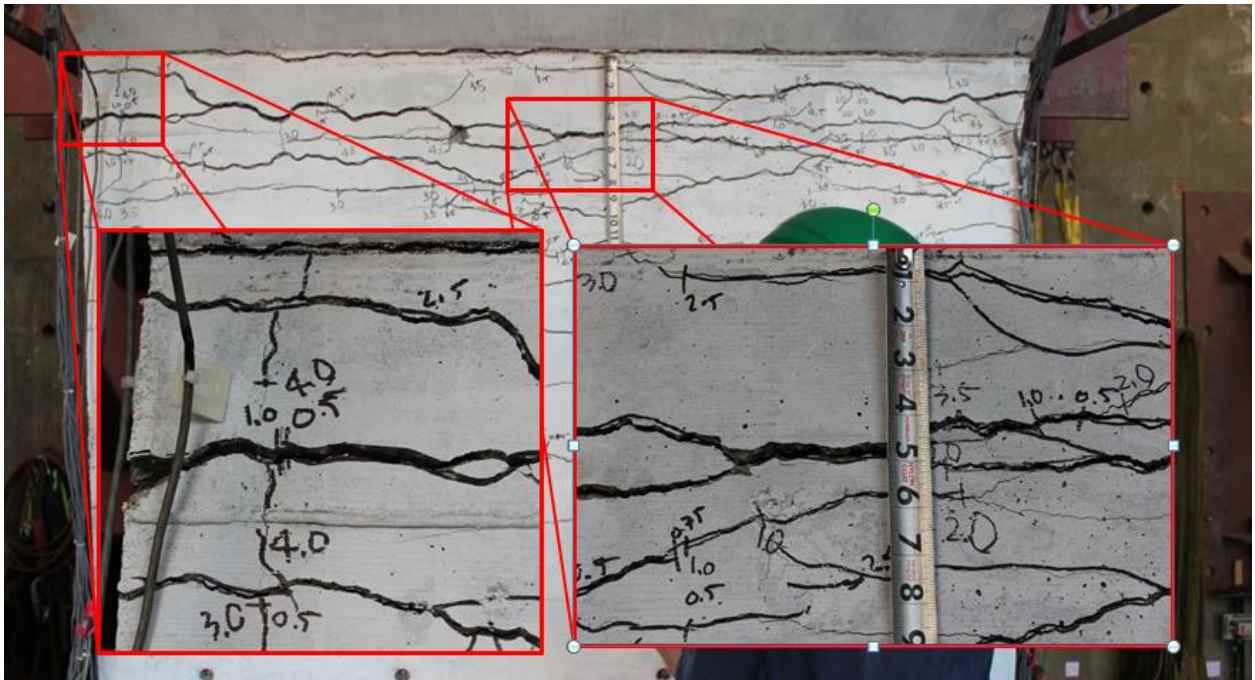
Flexural cracks at roof/south wall interface during positive extension at 6.0% drift ratio (Cycle 23-24). Picture of inside South wall at roof looking South.
